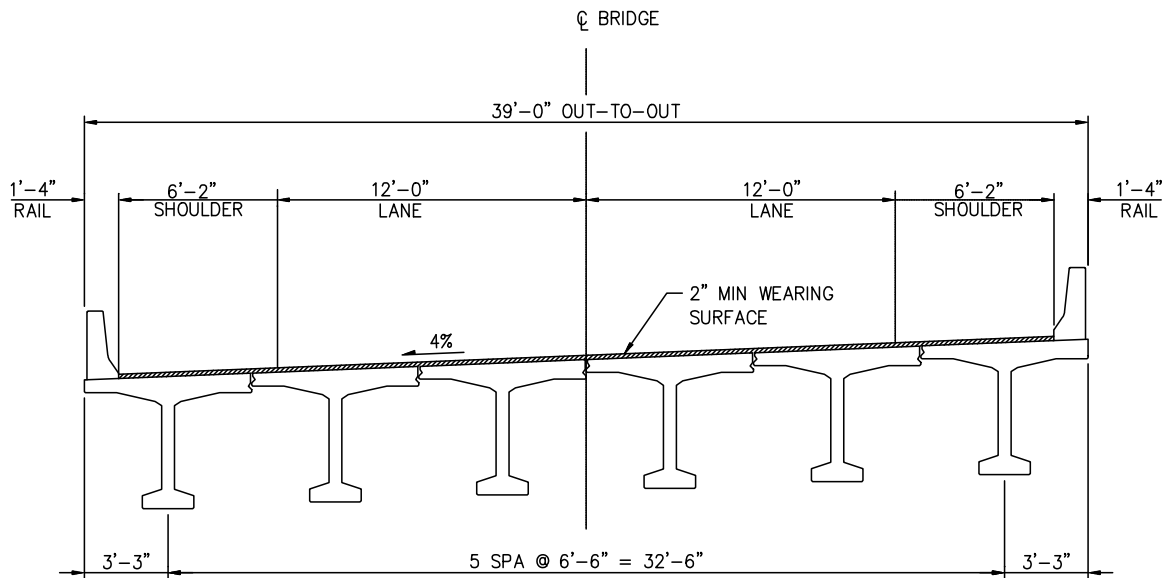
Typical Section of Deck Bulb Tee Girder Bridge
